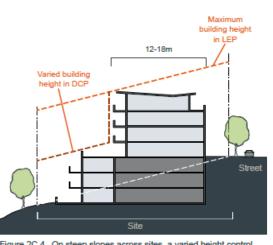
C.4 On steep slopes across sites, a varied height control can be applied that steps down towards the lower level of the site and helps create useful residential floor plates (12-18m) addressing the street
